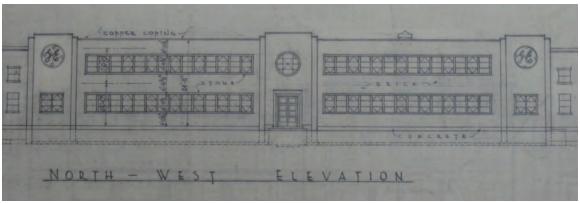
Office Building, plan of north elevation by Beck and Eadie Architects, 1946. (Source: GE Lighting)
